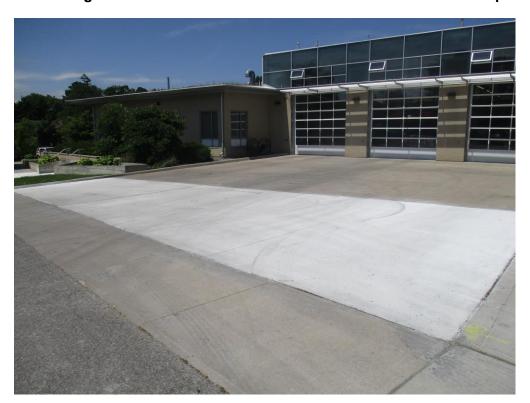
Interlock pavers and granular materials for area #3 has been removed and replaced with reinforced concrete slab.
